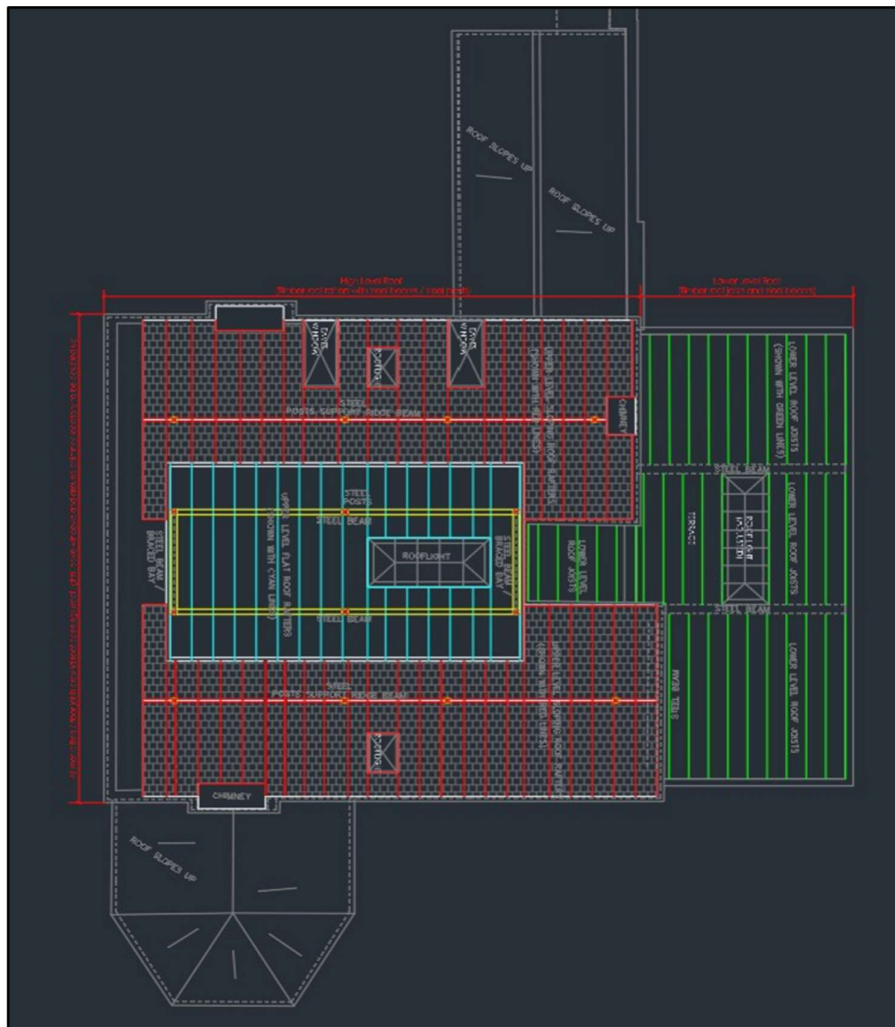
Main House Plan – New Roof - Indicative /concept structural member framing.
